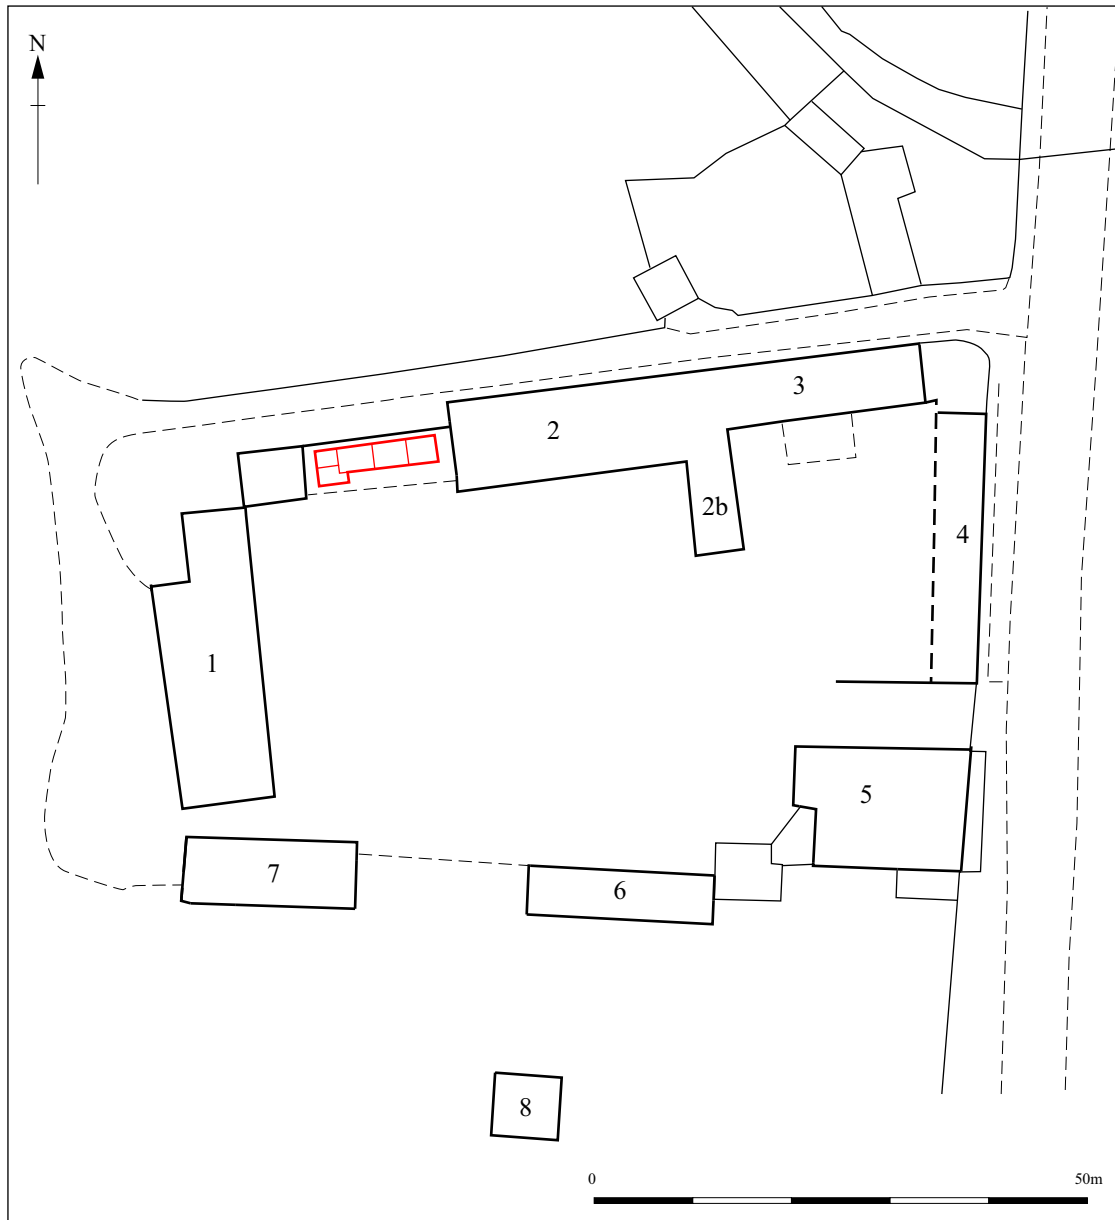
Plan showing location of buildings at Chipping Hall Farm and building footings which were subject to archaeological monitoring (red)
